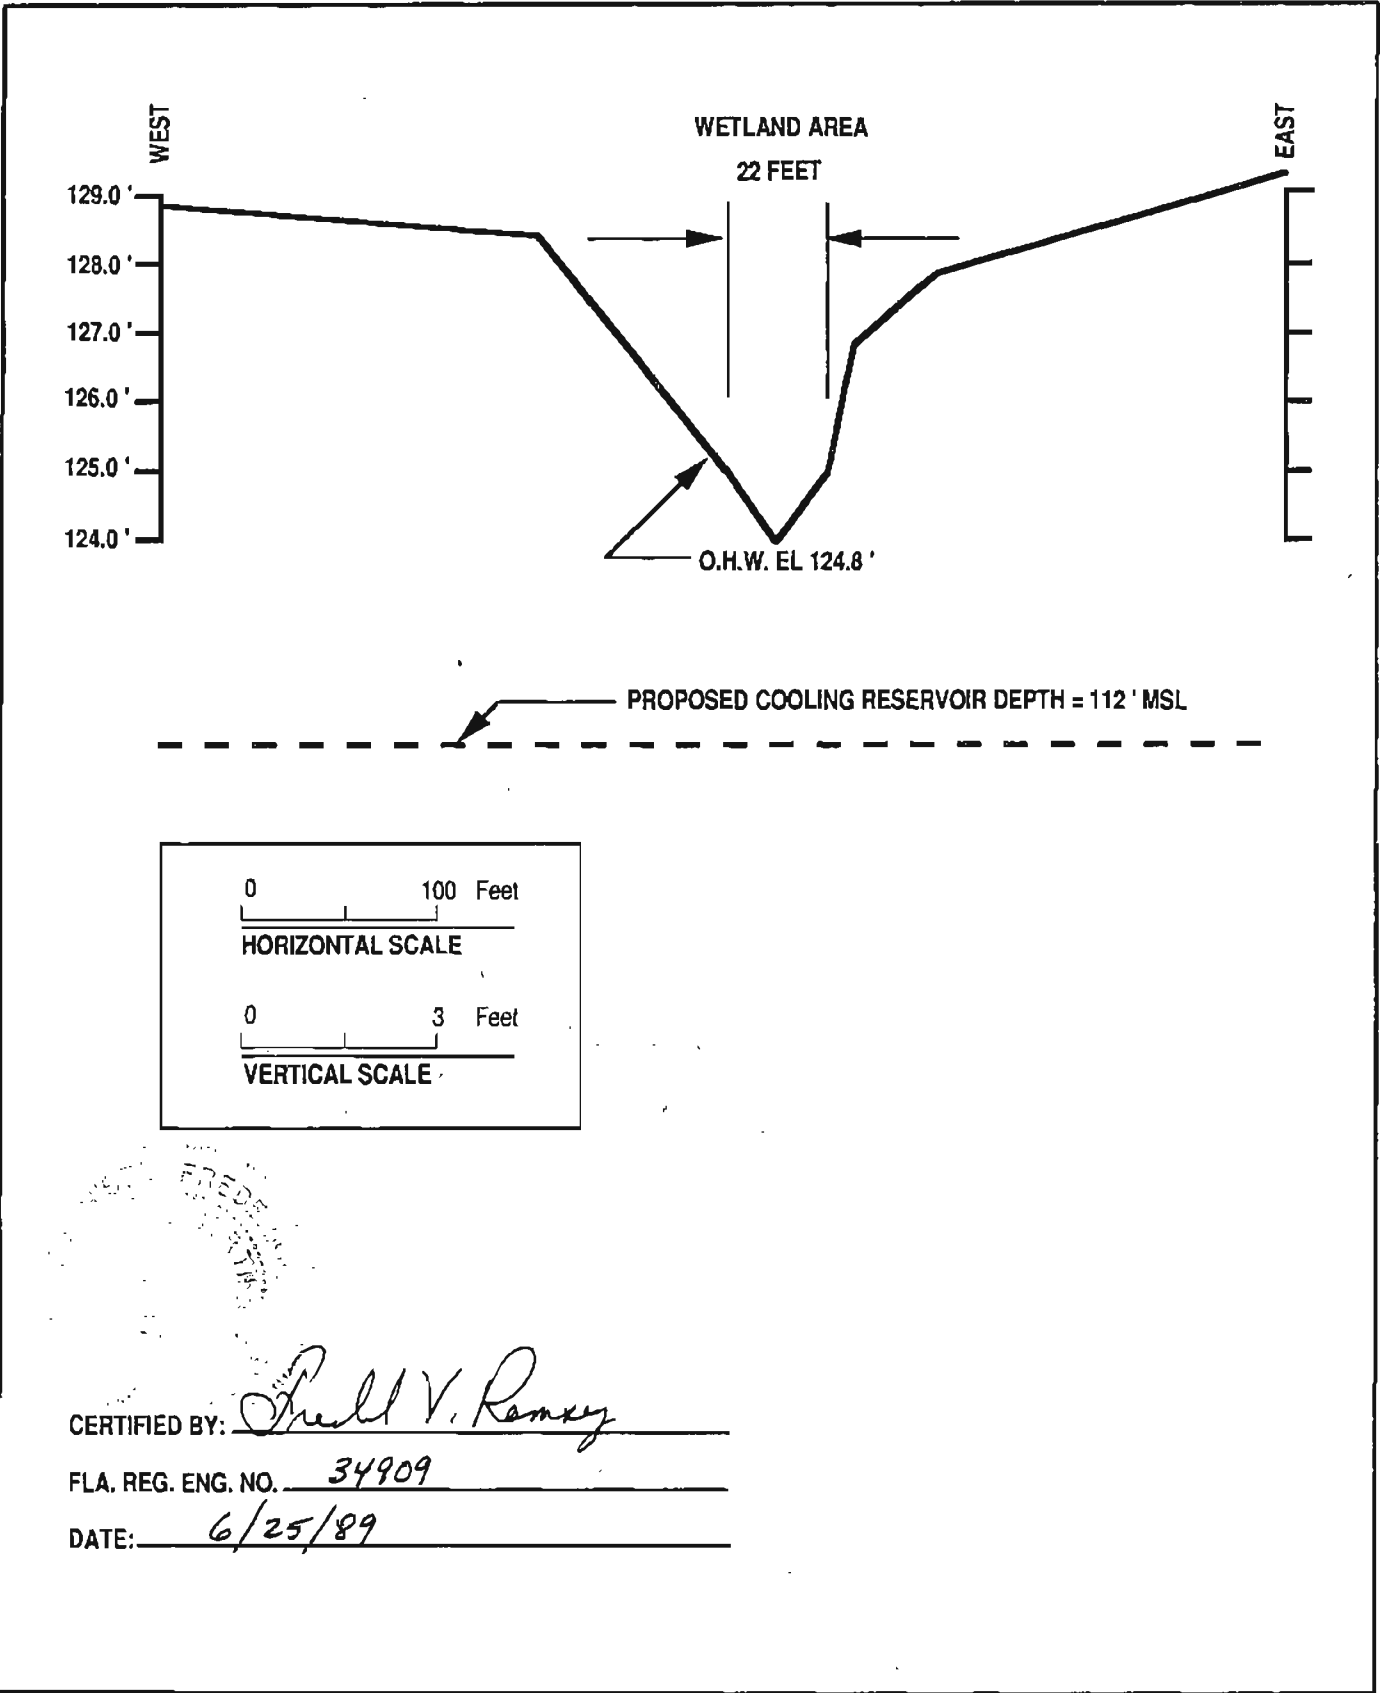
CROSS SECTION NO. 5 - LOOKING NORTH
